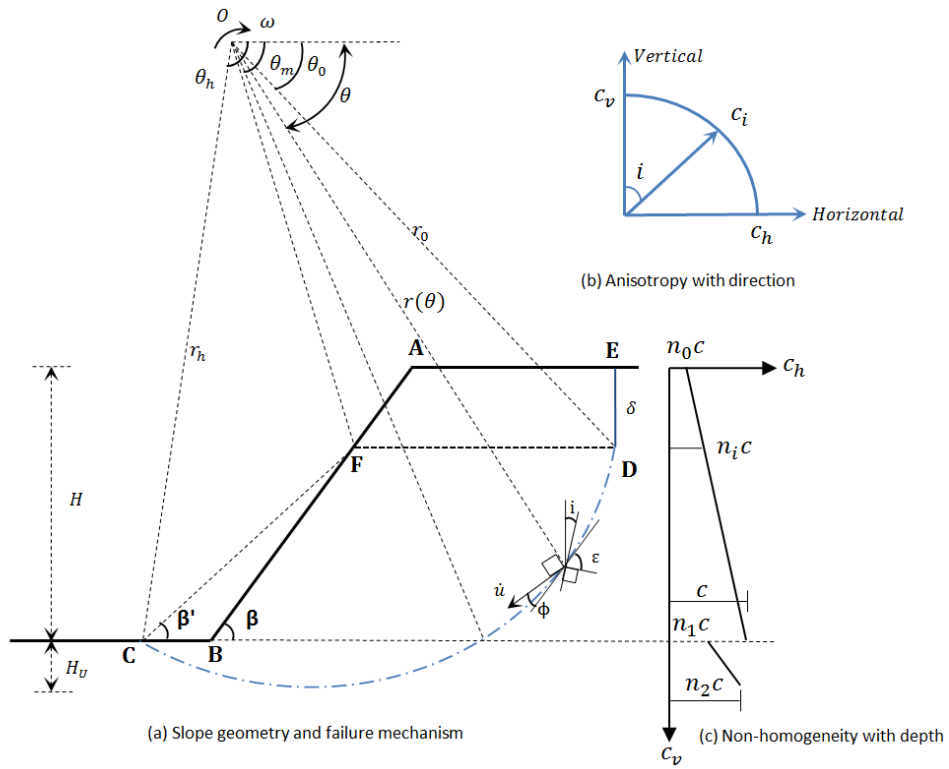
Slope geometry, failure mechanism and ground condition.
